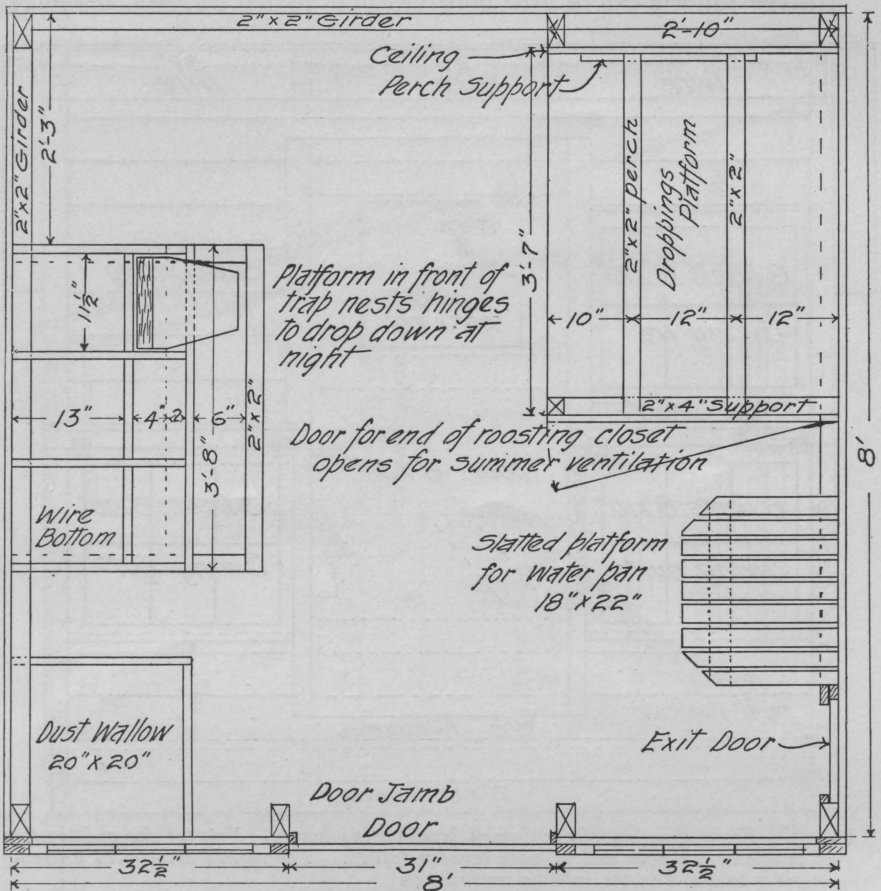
Floor plan of the Cornell breed-testing house, showing the location of different fixtures and timbers
